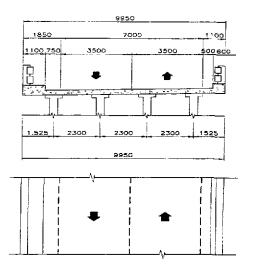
TYPICAL BRIDGE CROSS-SECTION OVER ANGAT
